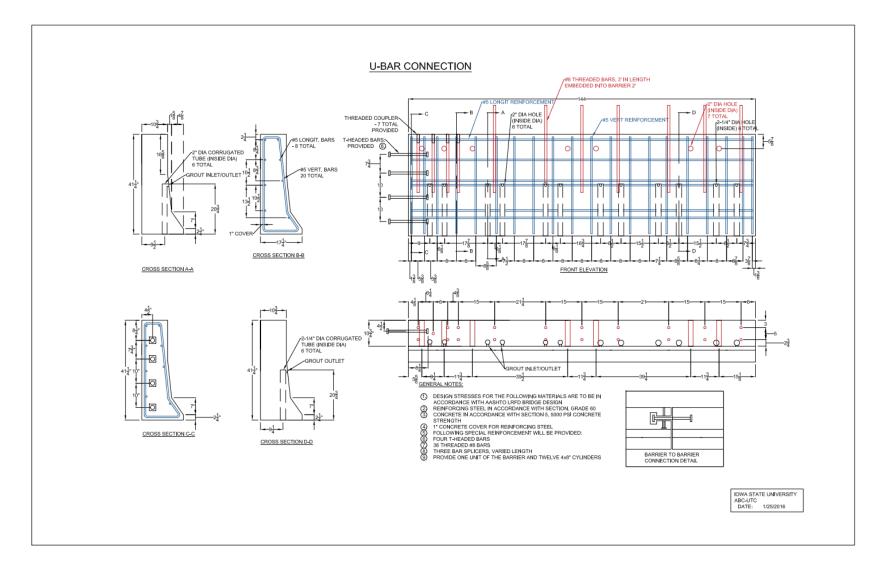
Detailed Prefabricated Barrier and Connection Drawings [2]
